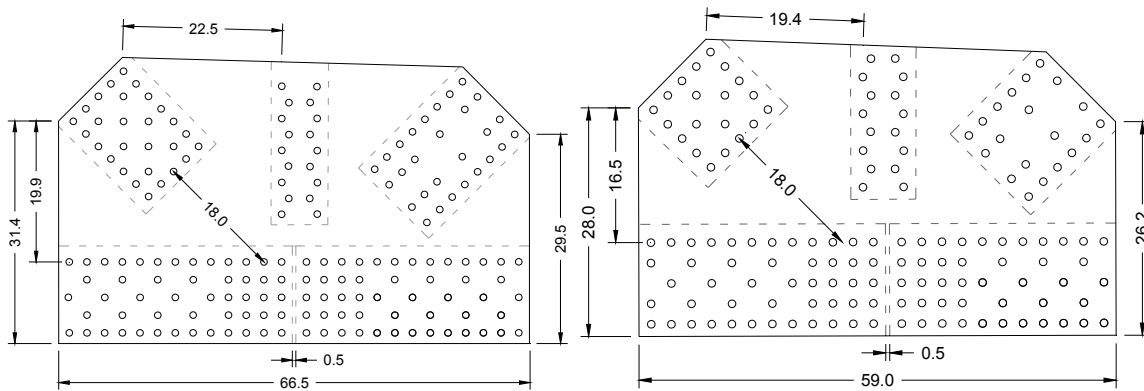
Dimensions in inches for LS3 specimens. (left) GP307LS3. (right) GP490LS3.
